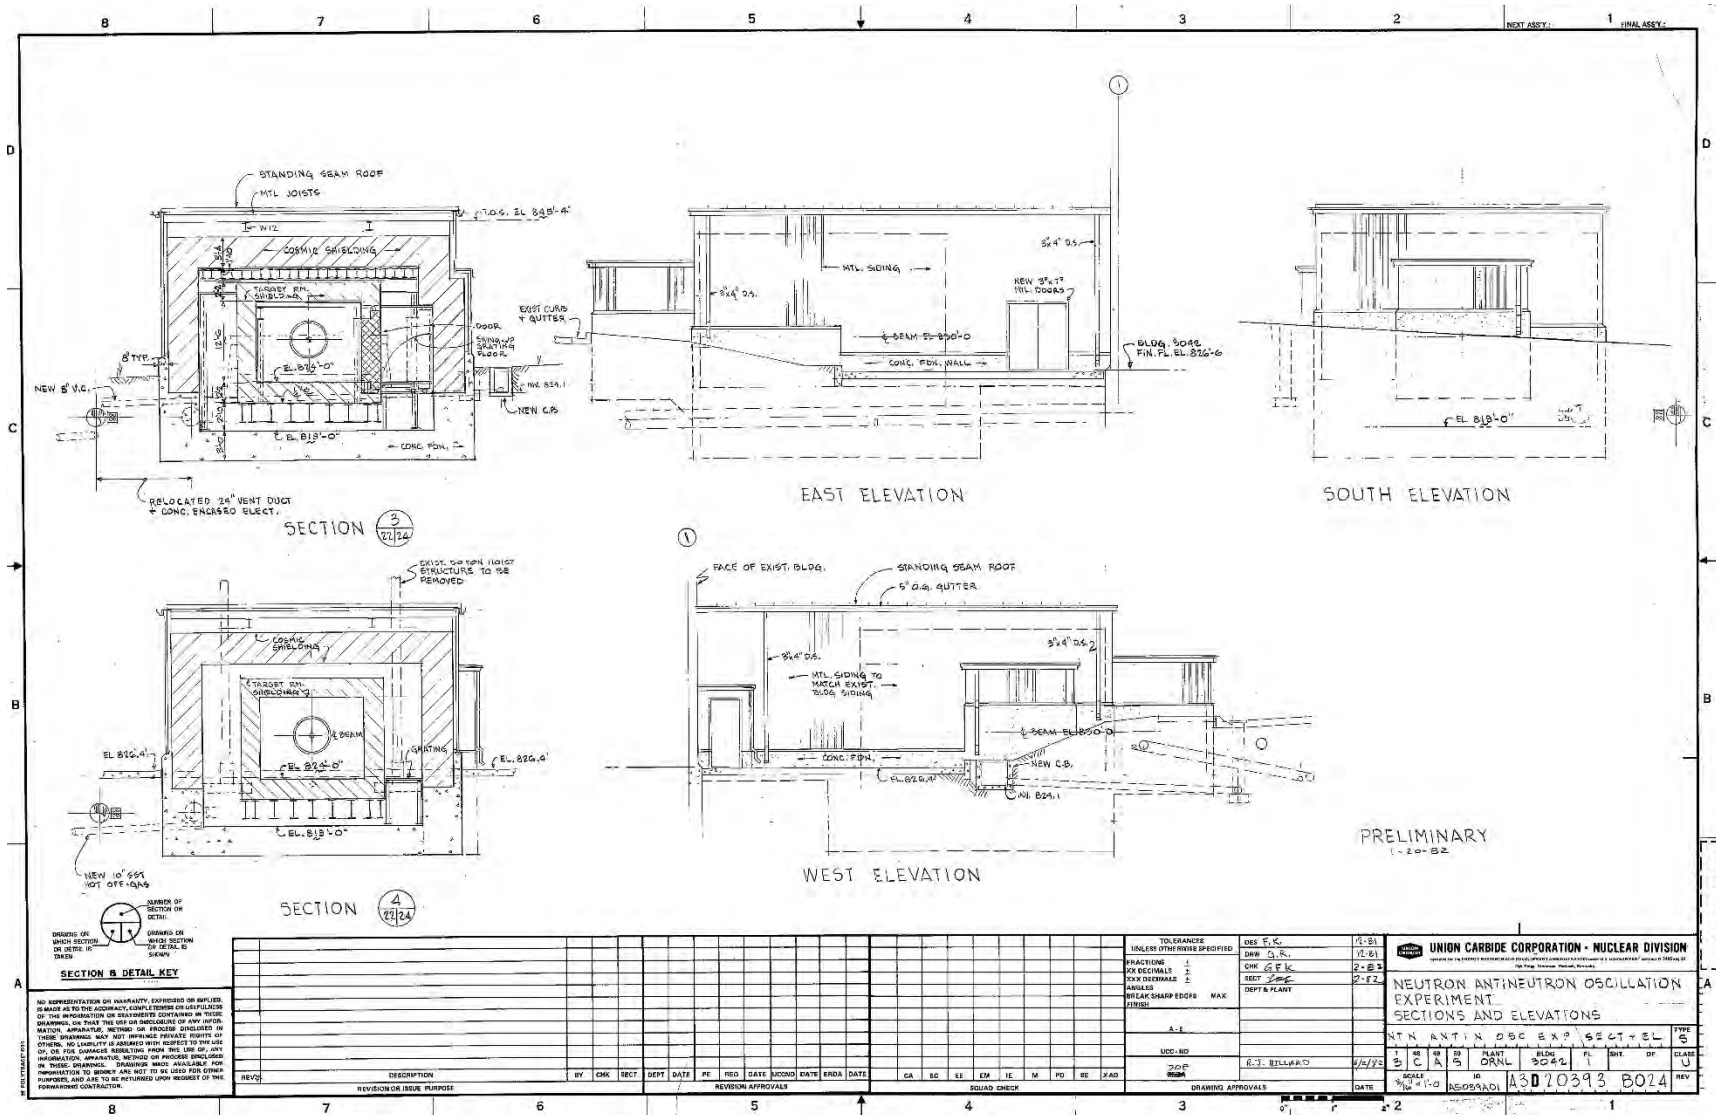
Preliminary drawing of sections and elevations pertaining to the neutron antineutron oscillation experiment proposed for construction on the south elevation of Building 3042 (Union Carbide Corporation, December 1981).
